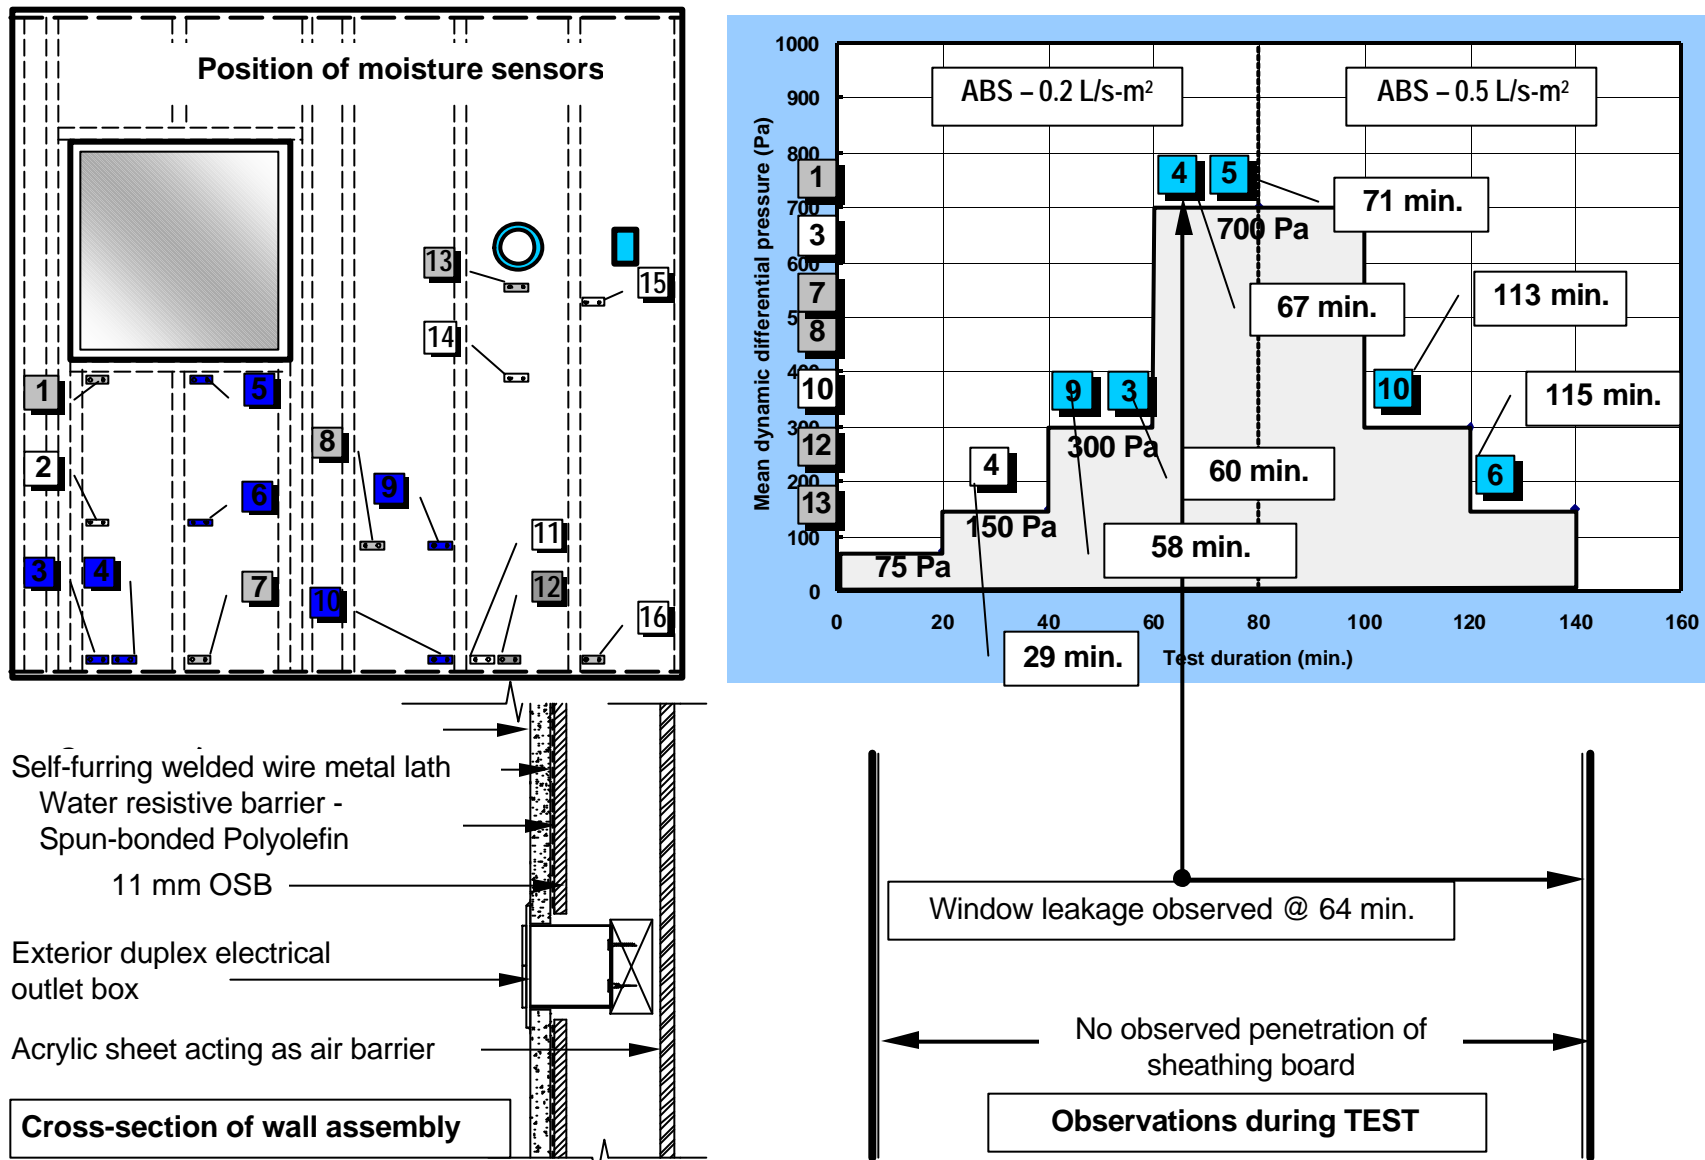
Stage 2 Water penetration of WA-3 - Dynamic test on Stucco-clad walls
